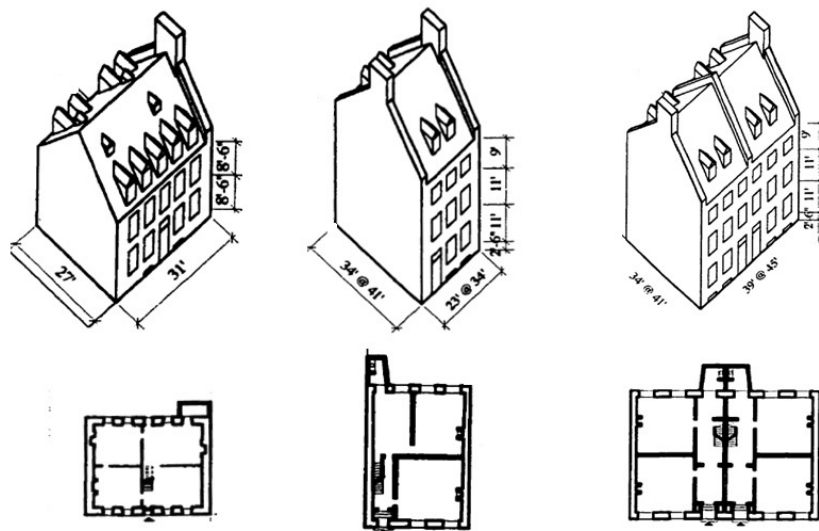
Main stone masonry building typologies in Old Quebec City [7].
